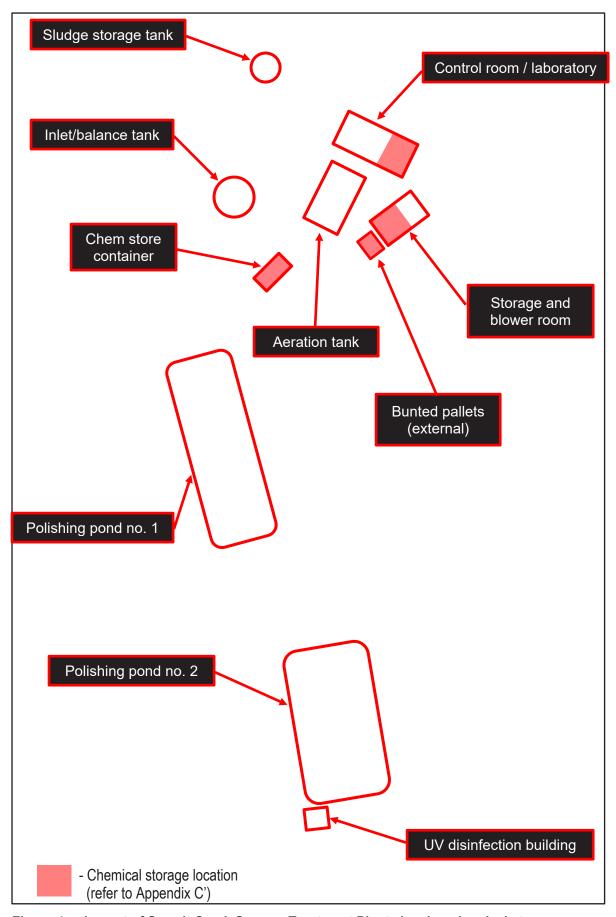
Layout of Sawpit Creek Sewage Treatment Plant showing chemical storage locations
